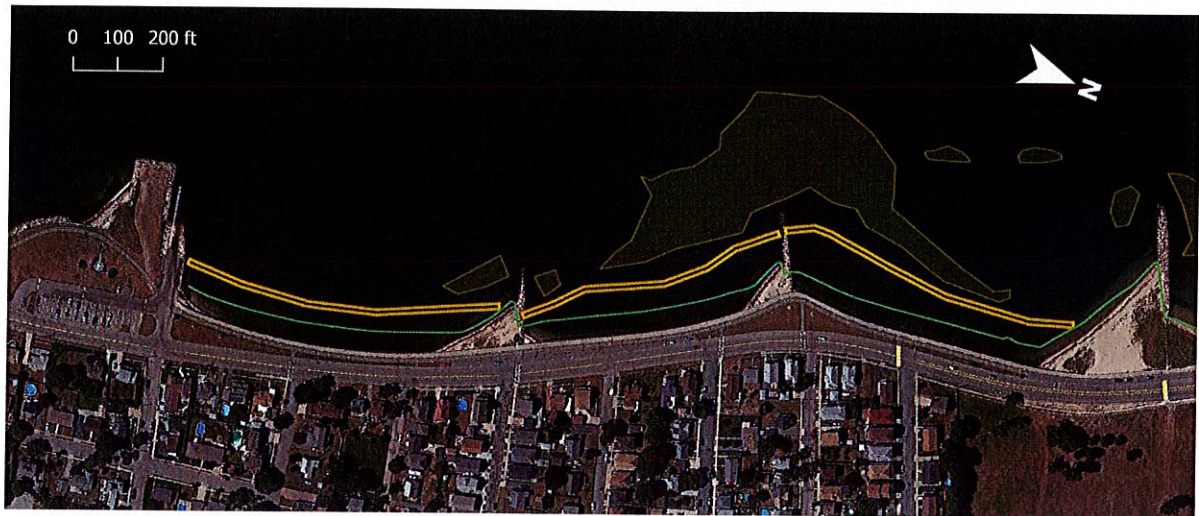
Conceptual plan for perched beach alternative, showing toe berm layout (orange-black line), and MHW line (green solid line) of the 40-foot wide beach. Areas of eelgrass identified in the May 2017 survey are also provided.
